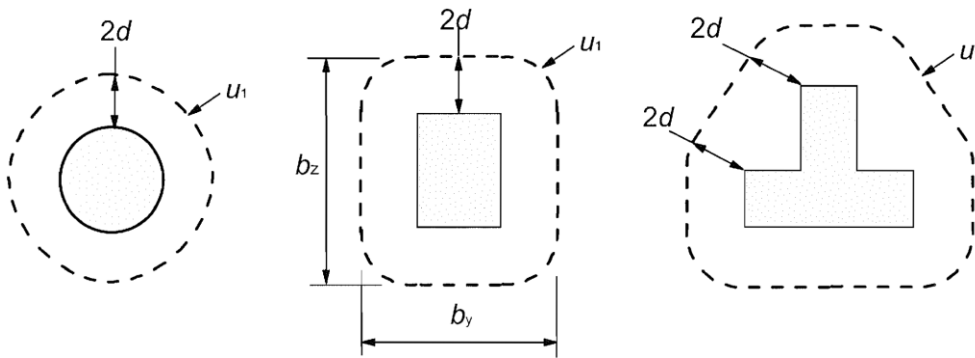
Basic control perimeter around loaded areas (Adapted from EC2 6.4.3)
